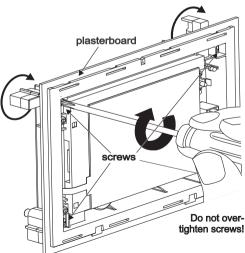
Tighten the screws and the mounting flaps rotate and clamp the wall
